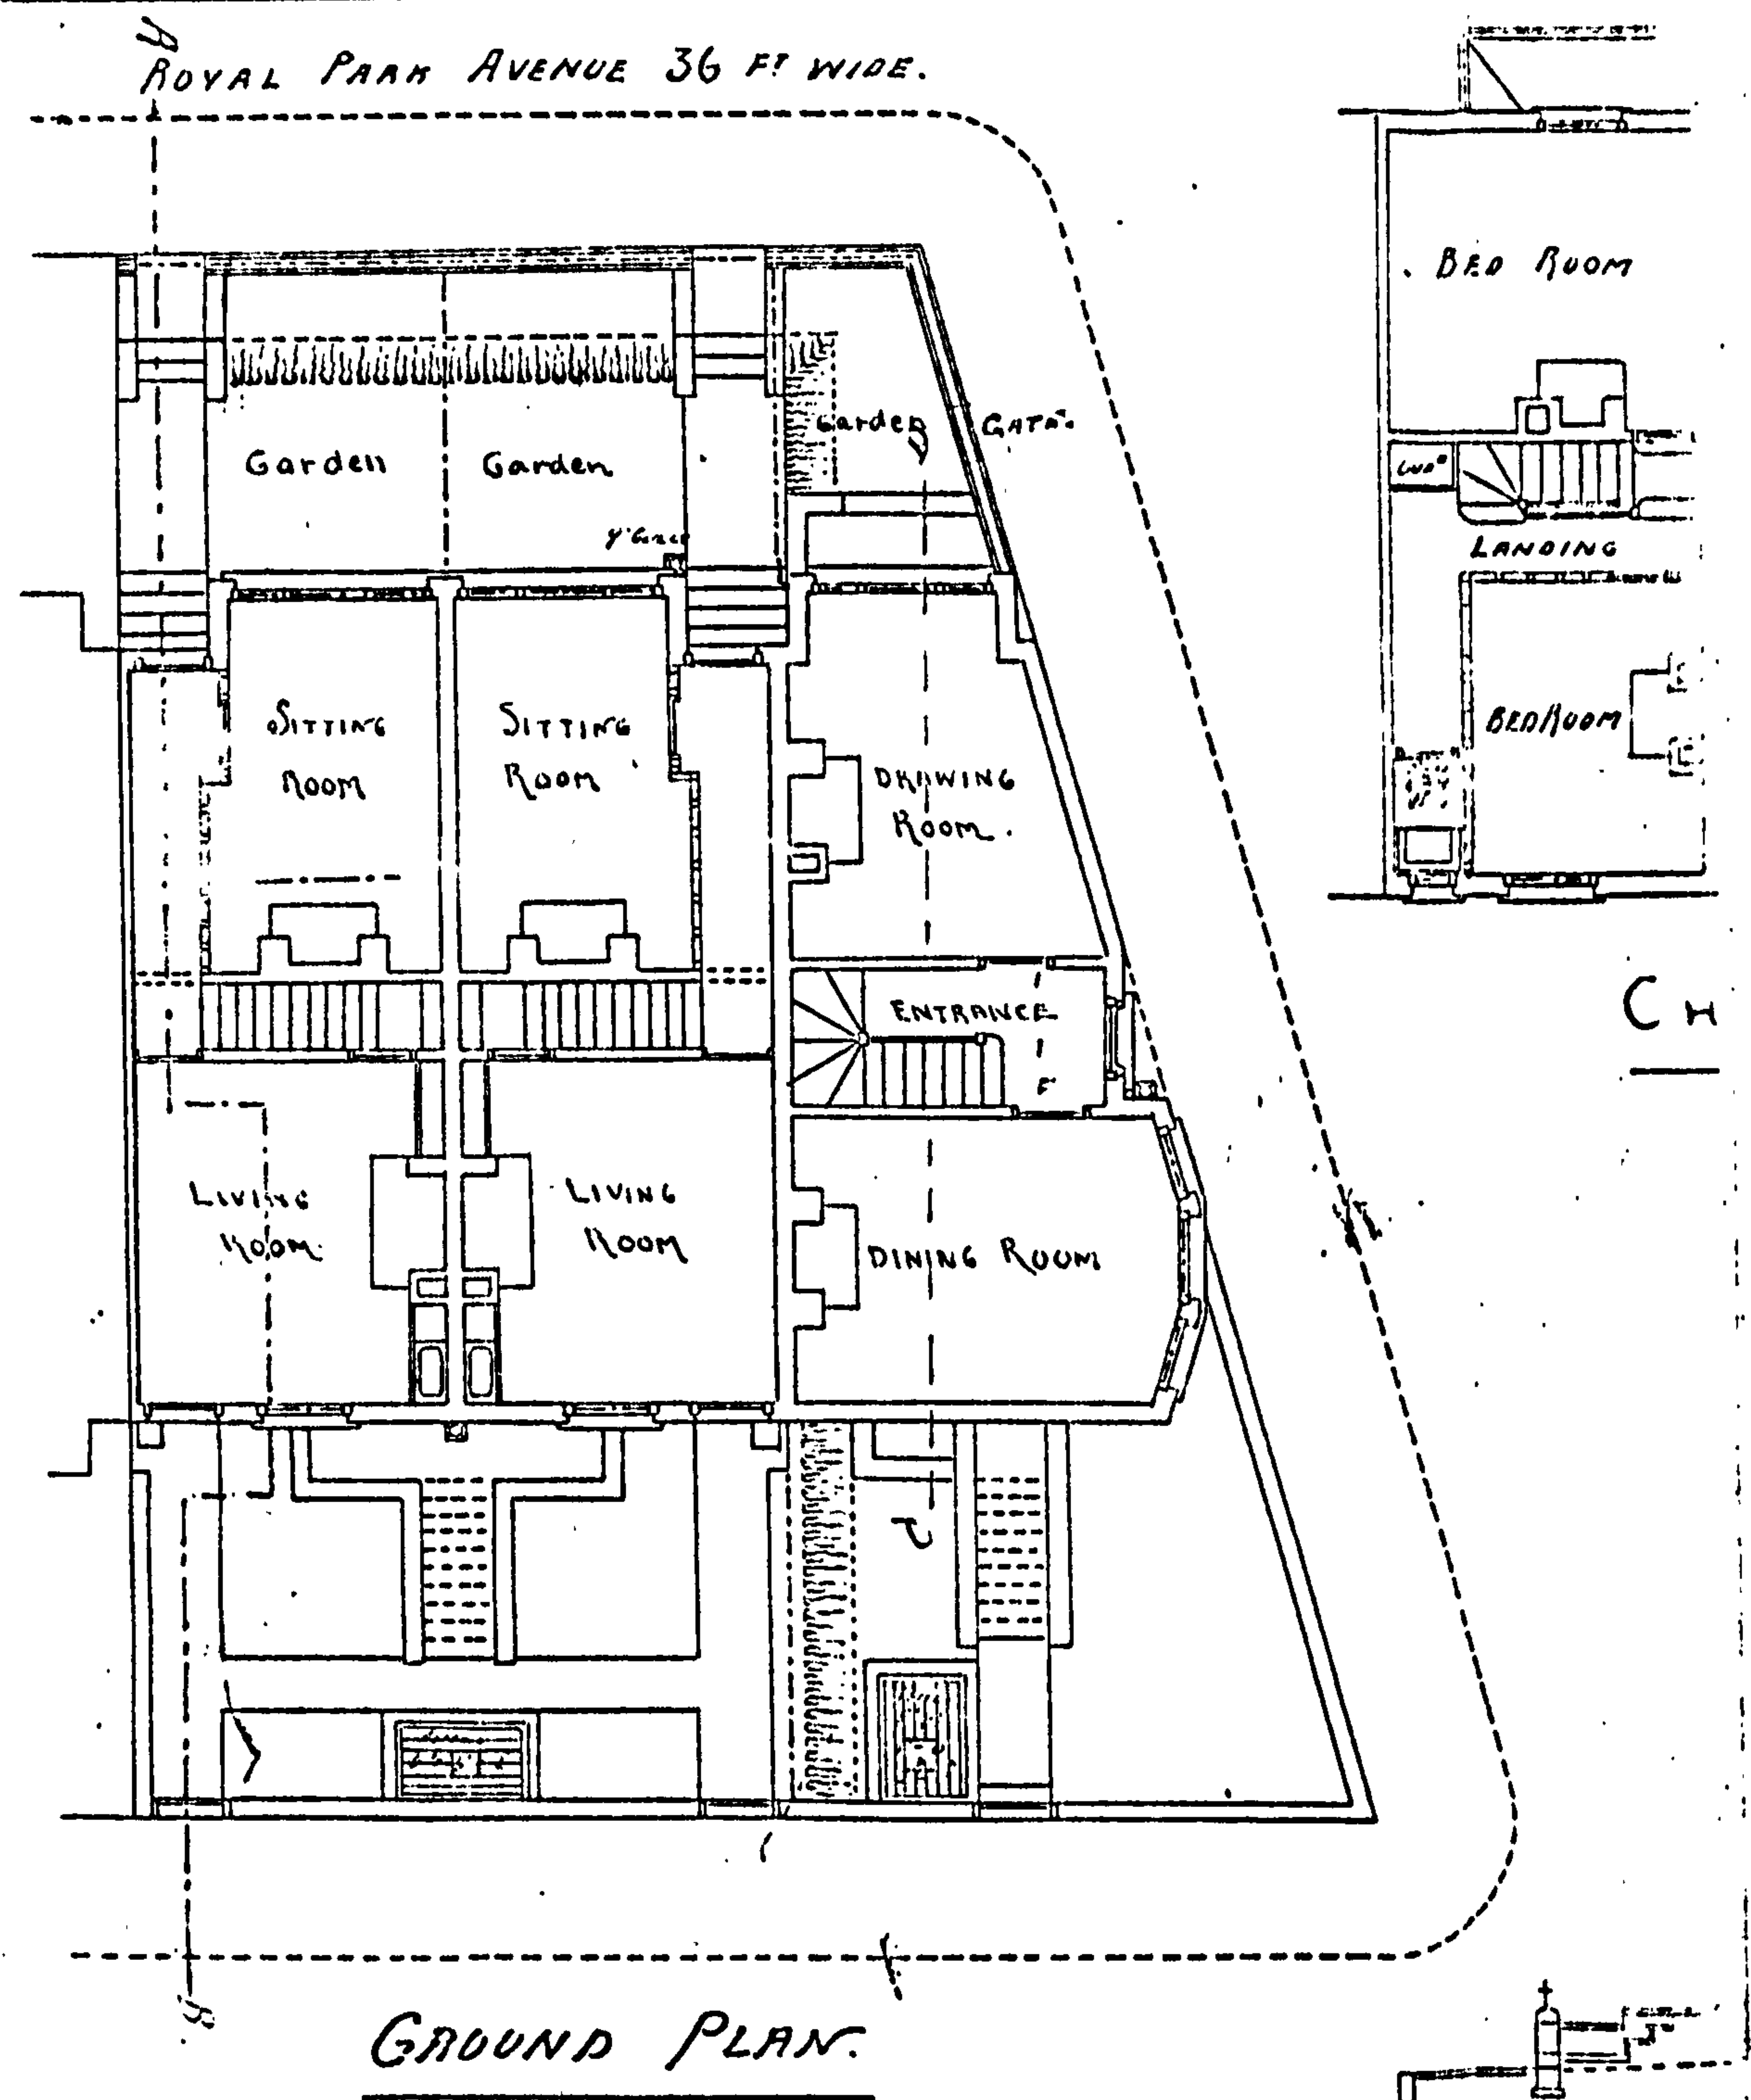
Deposited ground floor plan of end terrace house, Brudenell Avenue, (Swale & Mitchell 1891).
